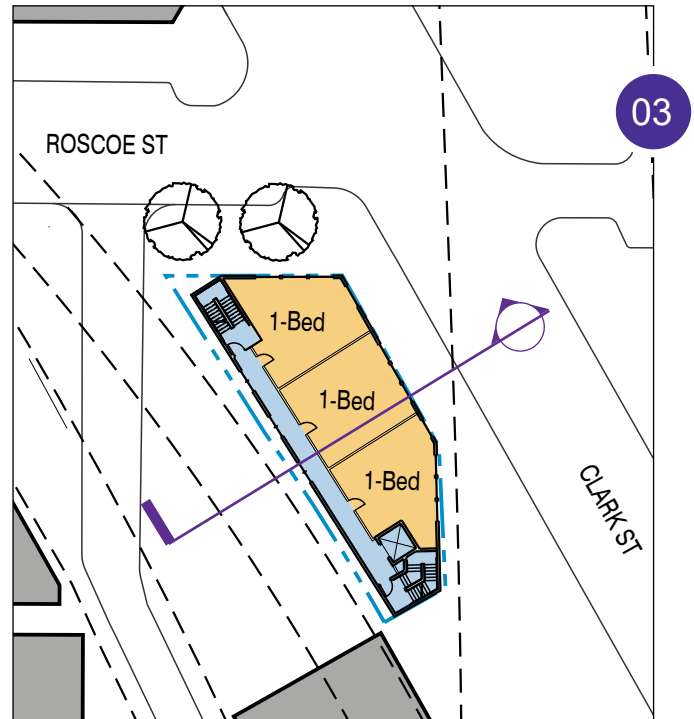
RPB 03 Mixed-use Development Concept Residential Floor Plan
